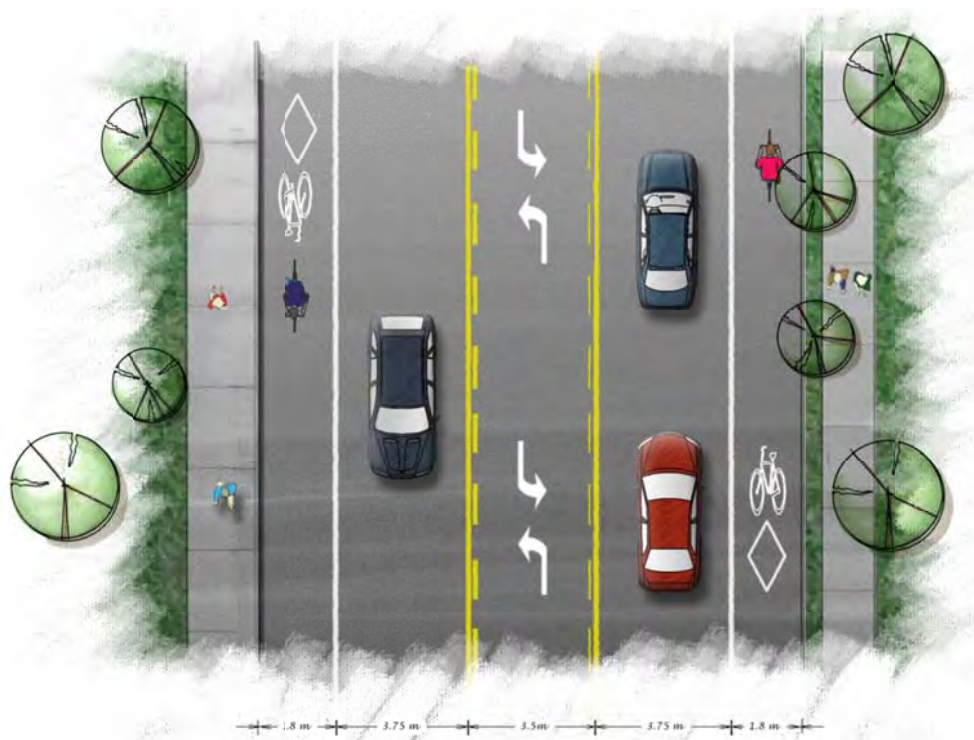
Conceptual Lane Layout – Road Diet (Two-way Left Turn Lane)
